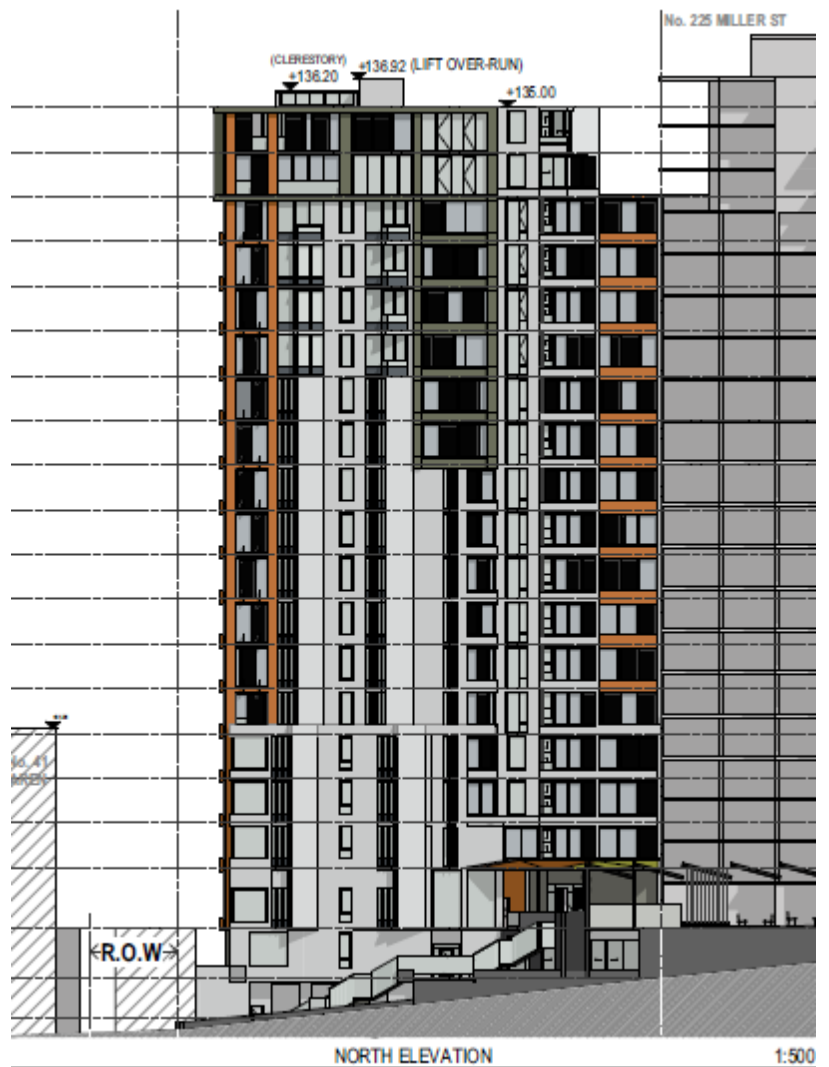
Proposed North elevation facing No. 39 McLaren Street, North Sydney.
